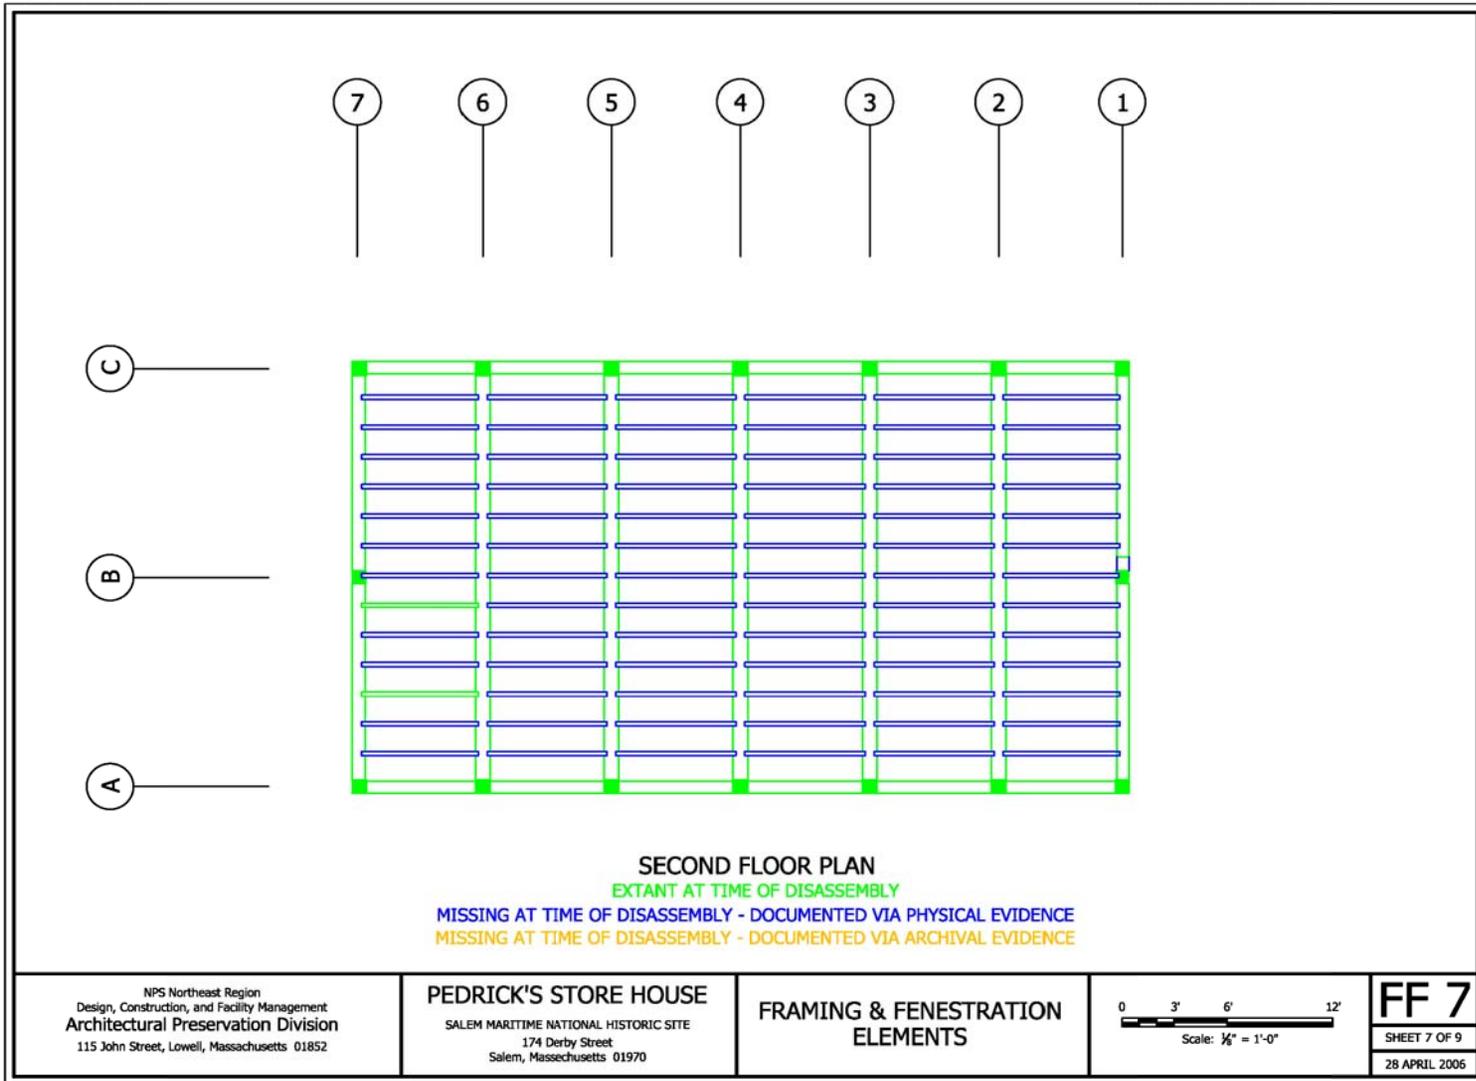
Measured drawing of framing and fenestration elements: Second-floor plan.
